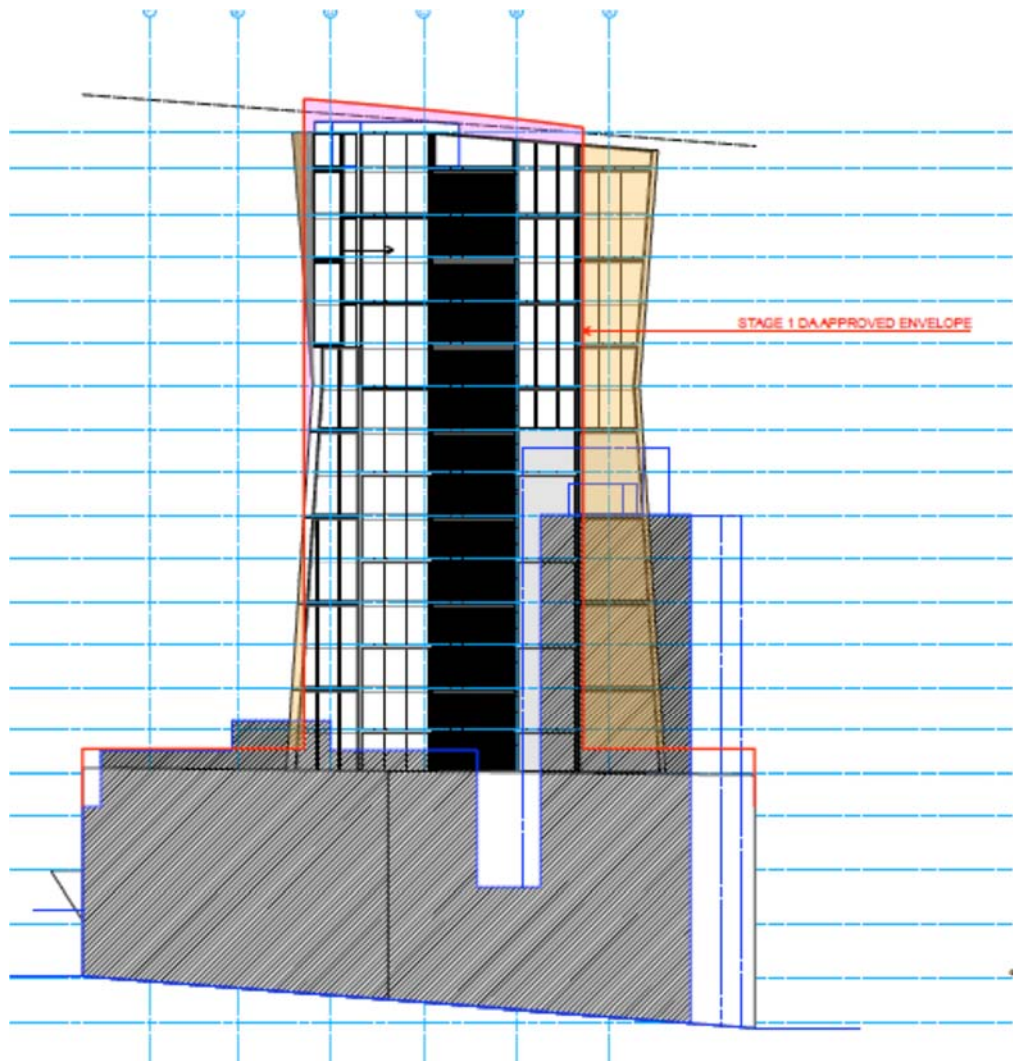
Amended envelope to Darlinghurst Road (east elevation). Approved Stage 1 envelope outlined in red. Proposed projections circled in black and shaded orange. Reduction to envelope shown at top of building and podium shaded pink.
